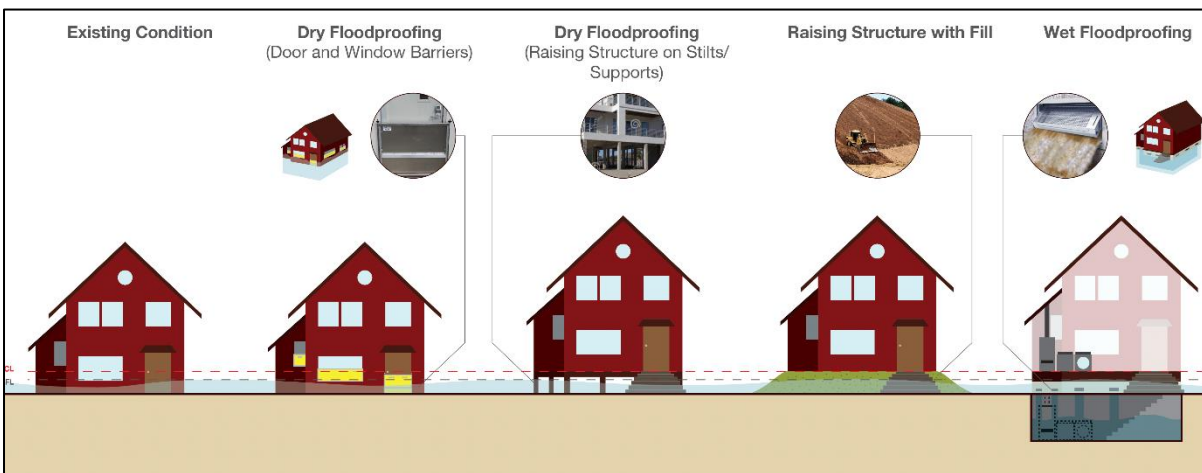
Examples of wet and dry floodproofing techniques for existing structures. Source: [Floodwise](#).
